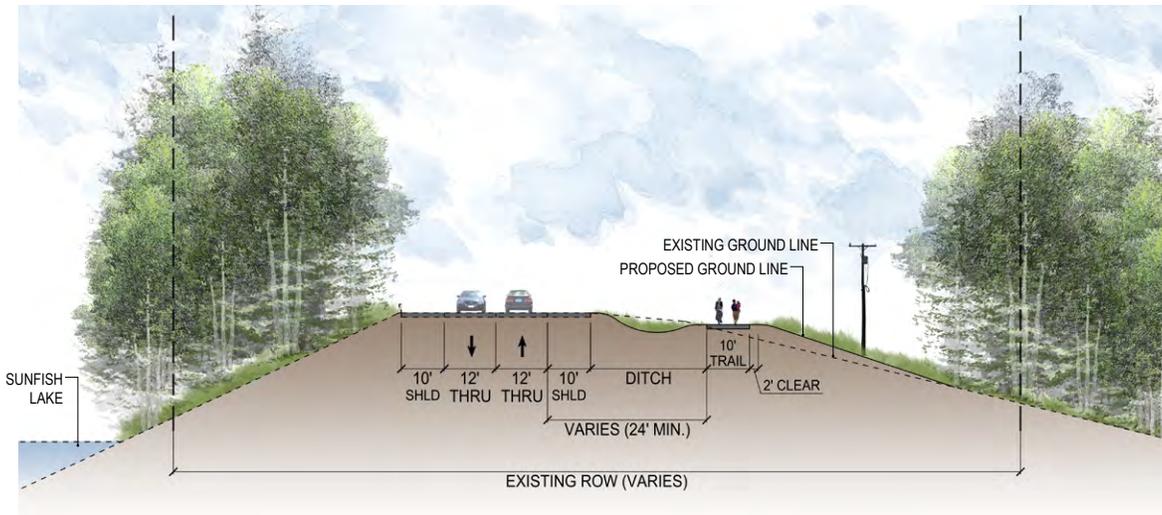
Typical Section for the Proposed Trail along CR 14 West of Lake Elmo Avenue
